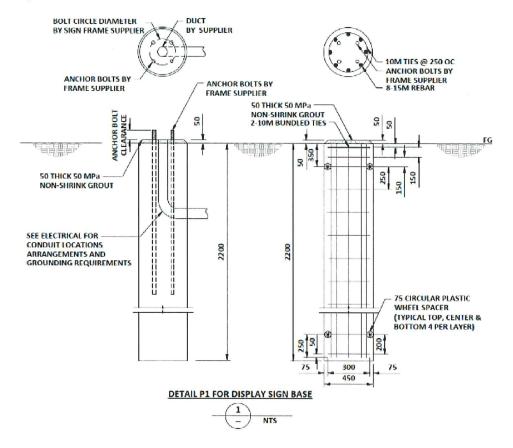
Cast-In-Place Reinforced Concrete Pile Sketch
